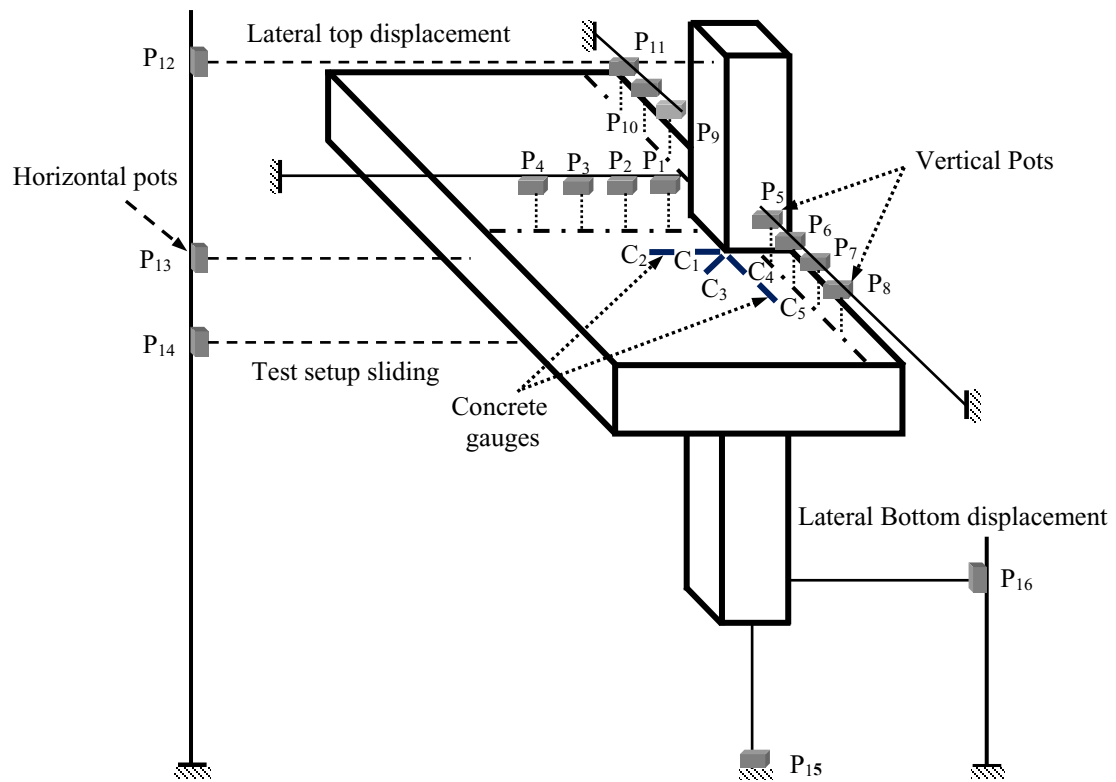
String potentiometers and concrete gauges instrumentation
